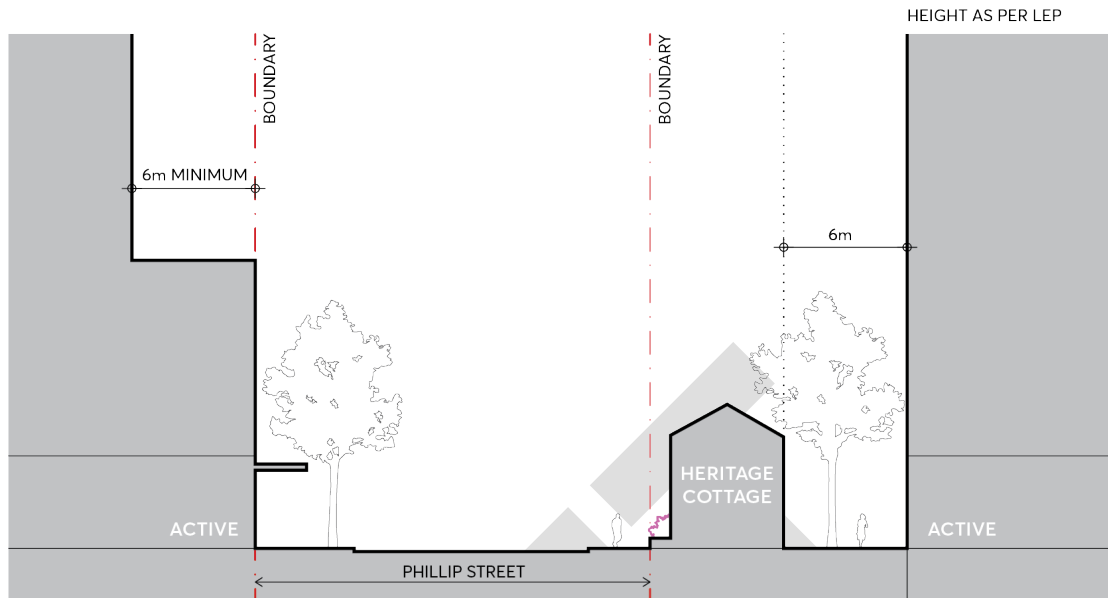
City East Block Phillip Street at 66 Phillip Street (Section C)
